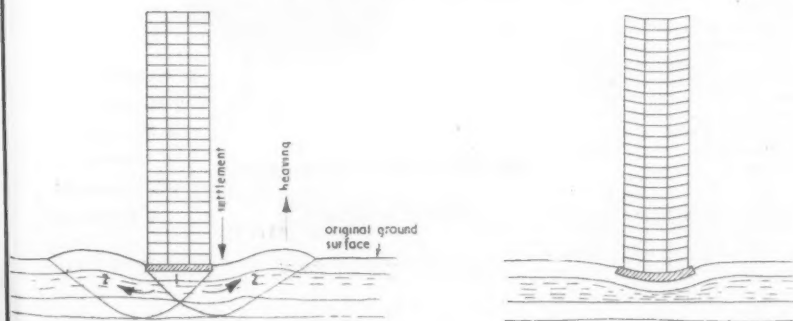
(far left). Foundation failure by shear failure of the underlying strata. Fig. 2 (left). Foundation failure by excessive differential settlement arising from consolidation of a compressible stratum.
